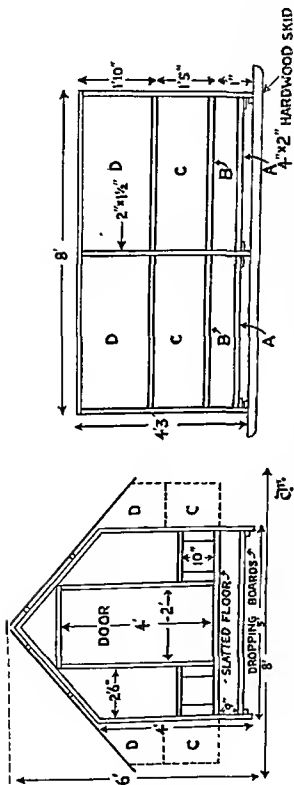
SLATTED-FLOOR HOUSE. END AND SIDE SECTIONS
